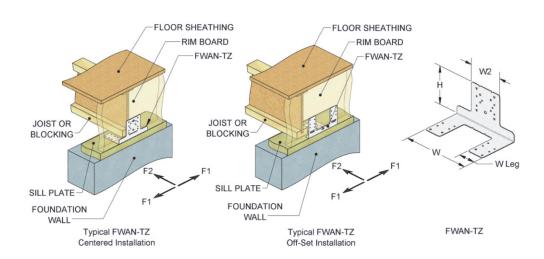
FWAN-TZ FOUNDATION WALL ANCHOR AND TYPICAL INSTALLATION DETAILS
